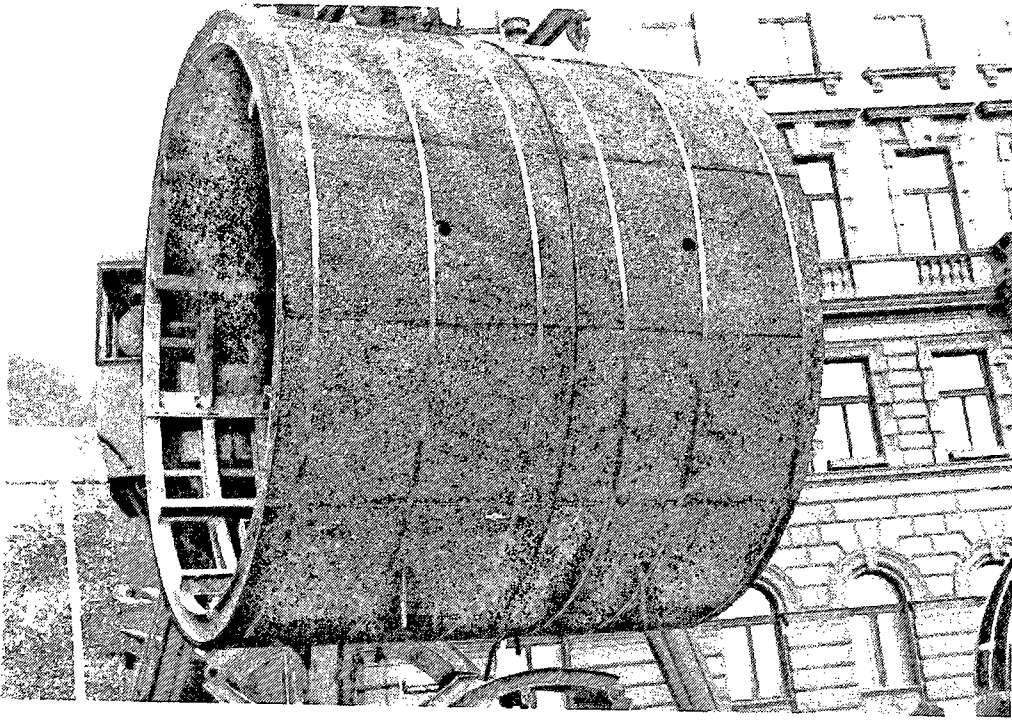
Placing of resin concrete segments on steel shuttering cages.
